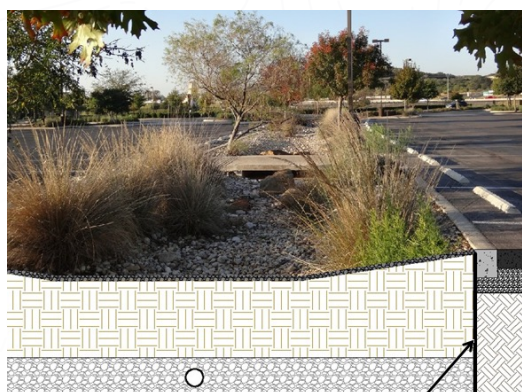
(left) Bioswale at Rim Retail Center, San Antonio, Texas showing example cross section with hydraulic restriction barrier to prevent lateral seepage to adjacent pavement subgrade.
